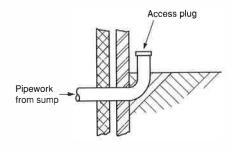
Pipework from sump capped-off with an access plug just above ground level
